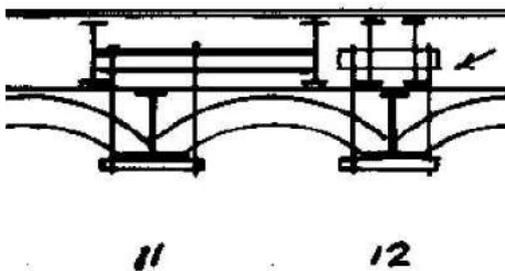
Section from LM&SR Road and Rail Traffic Act 1933 drawing
